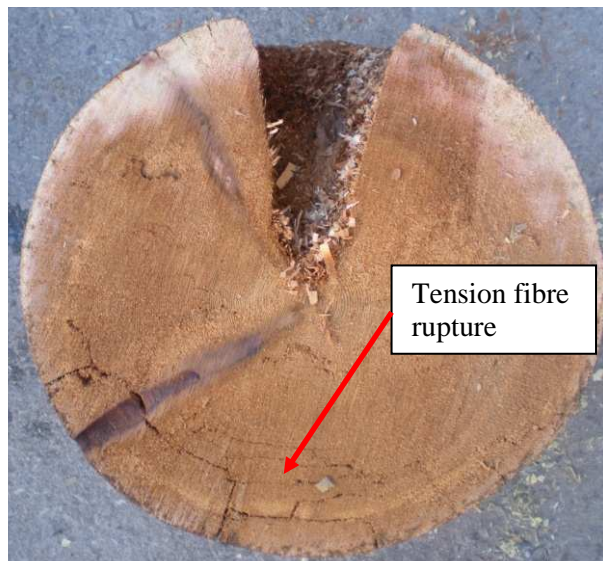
Cross-section of in-service specimen with compression damage (C-1-1).
